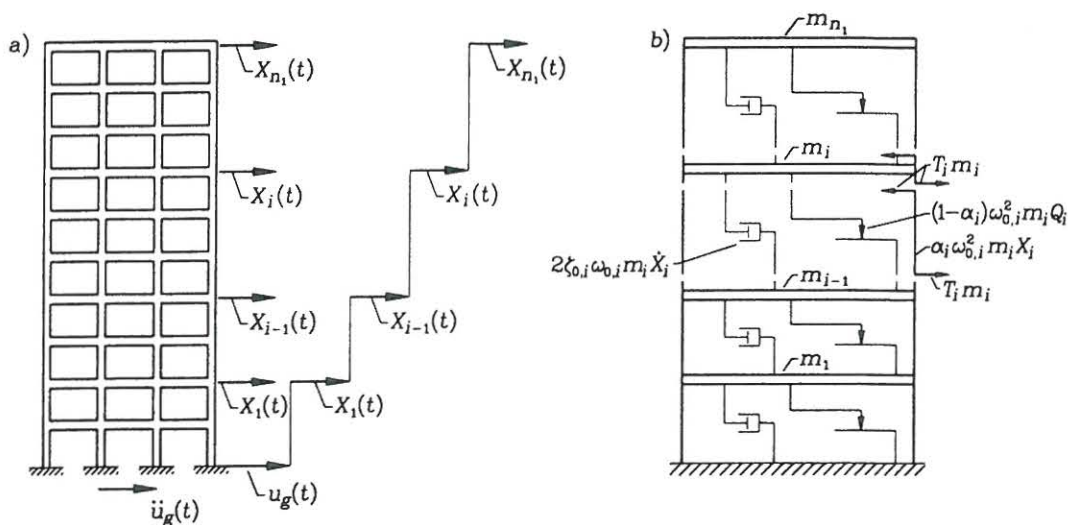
A) Instrumented reinforced concrete structure. B) Equivalent shear model.
